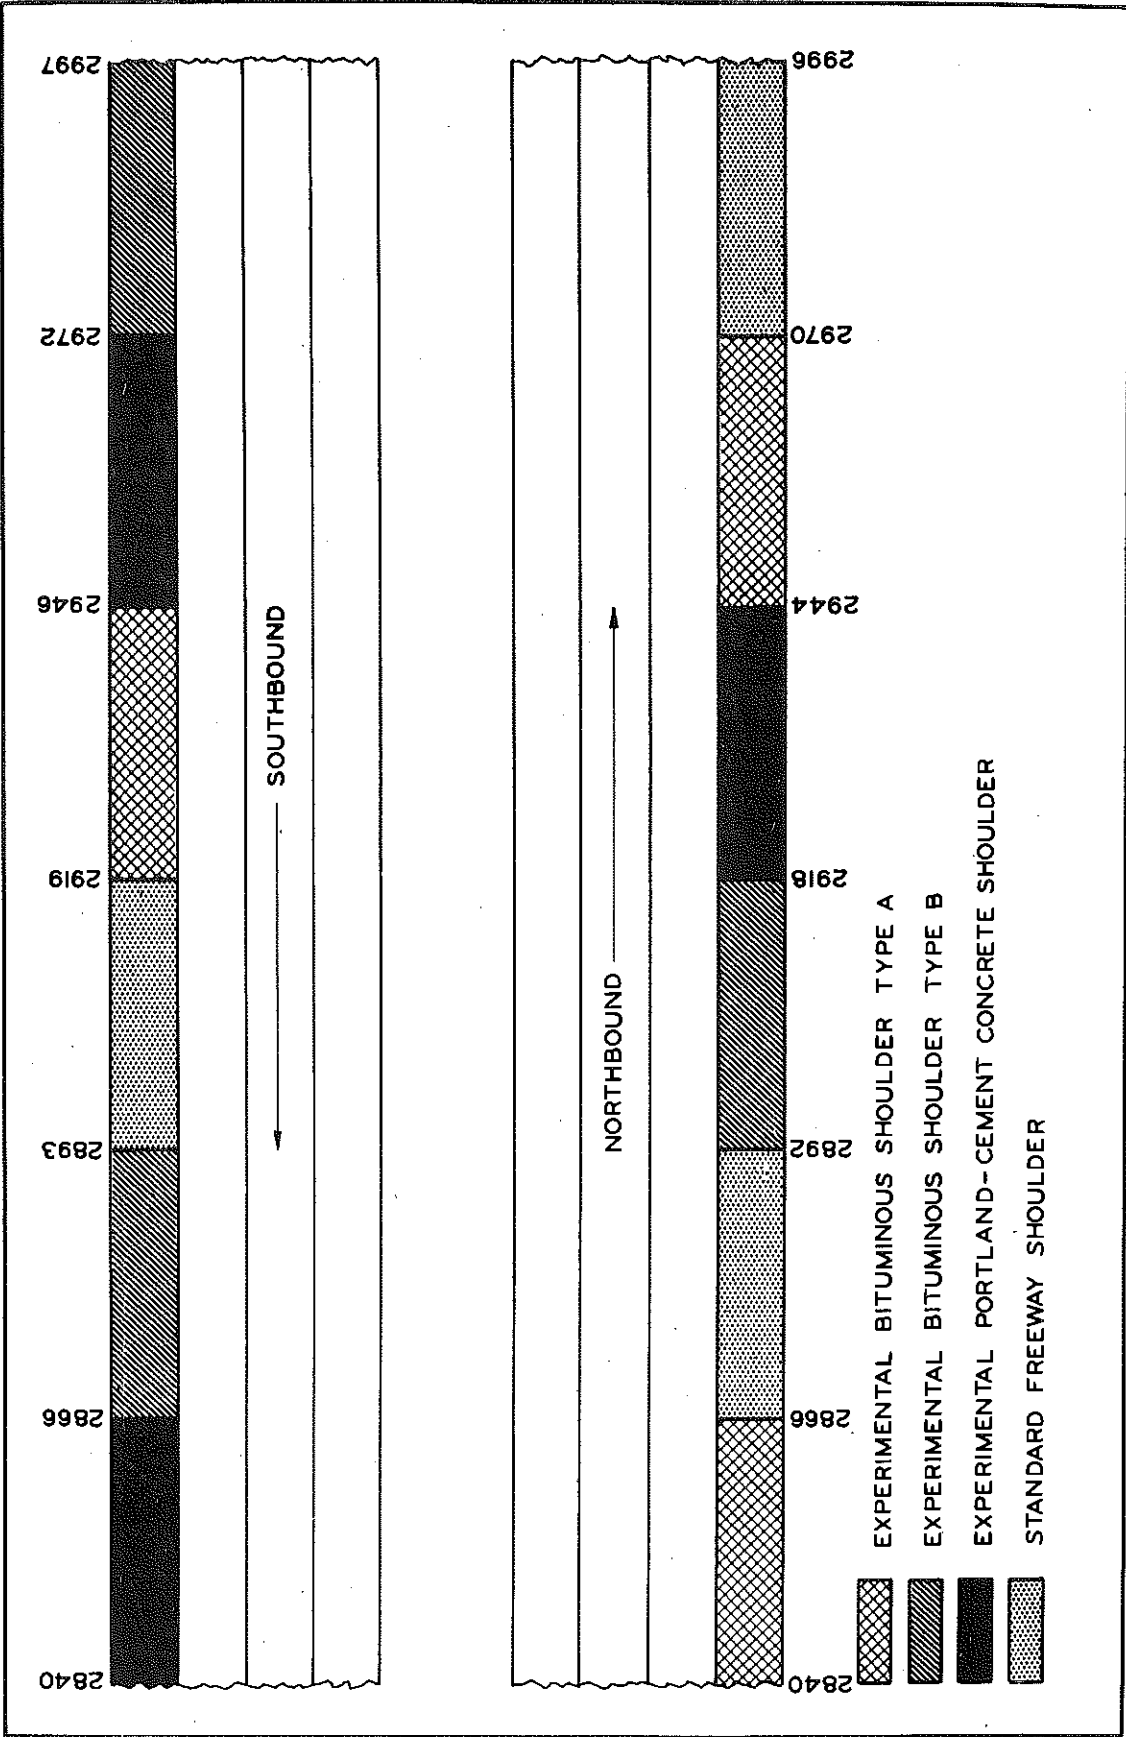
Test section locations for experimental shoulders I 69 Stine Rd to Five Point Hwy.
